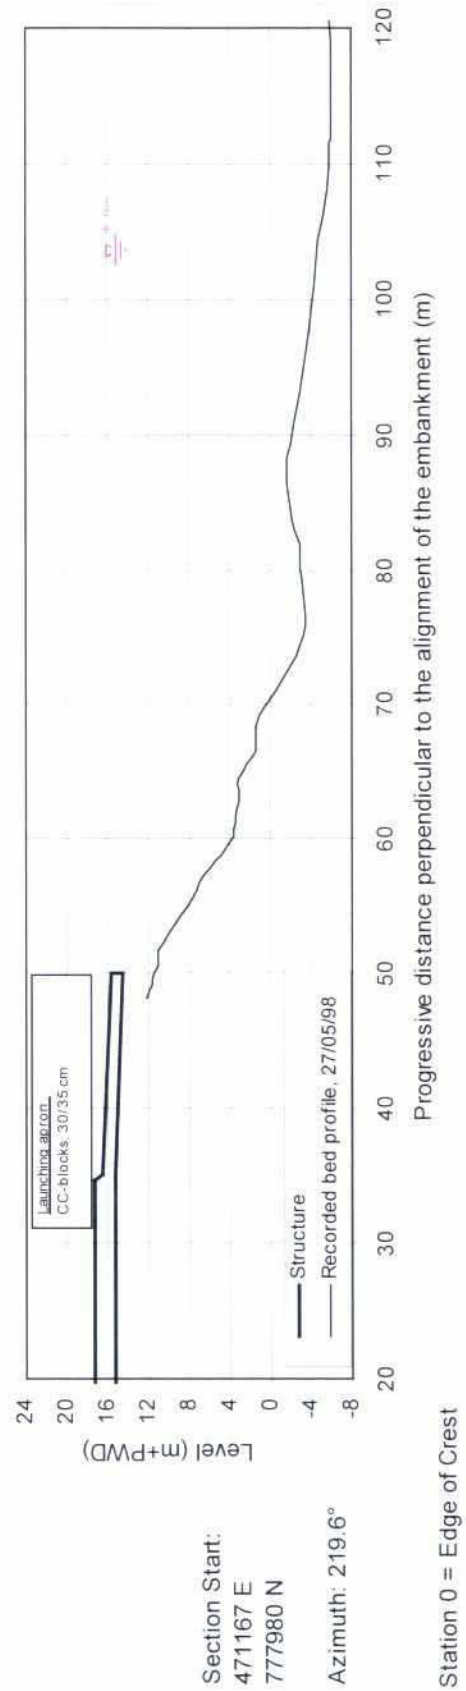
Steepest slope surveyed in Section H-1 and H-2
